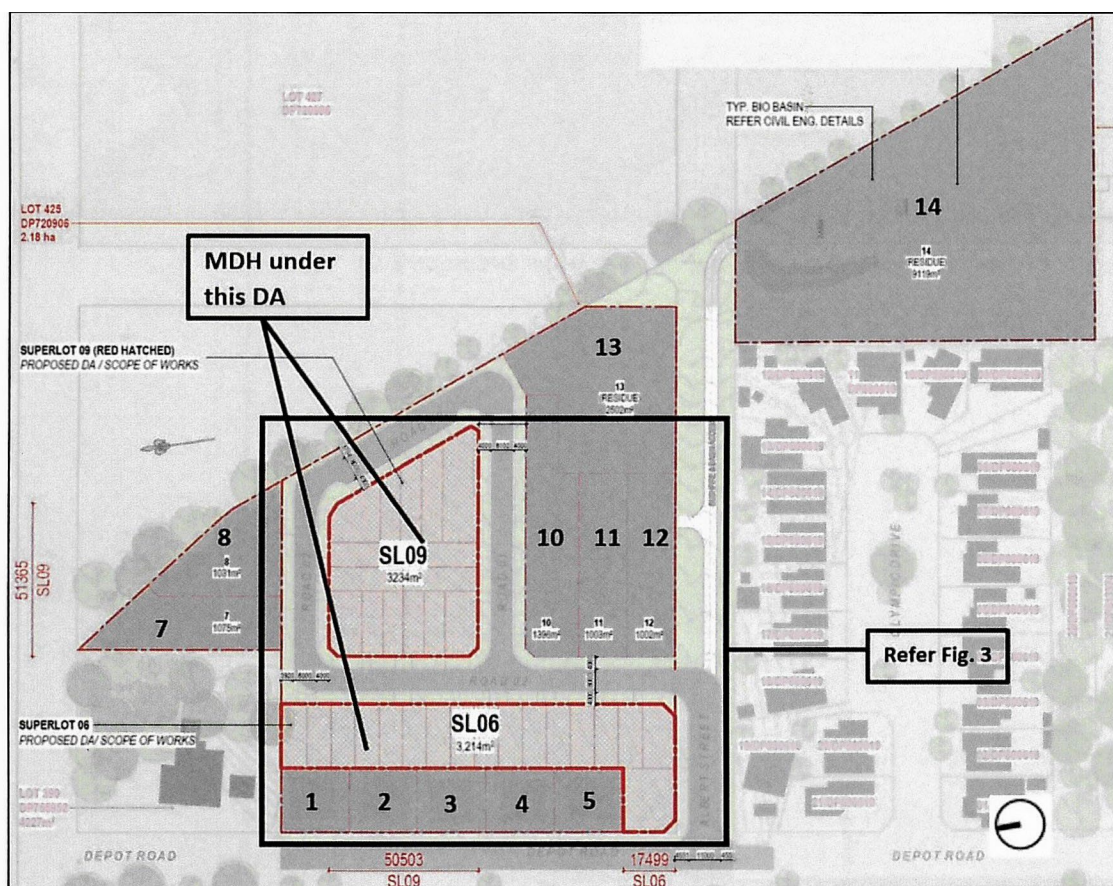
Excerpt showing subdivision layout and multi-dwelling housing location
